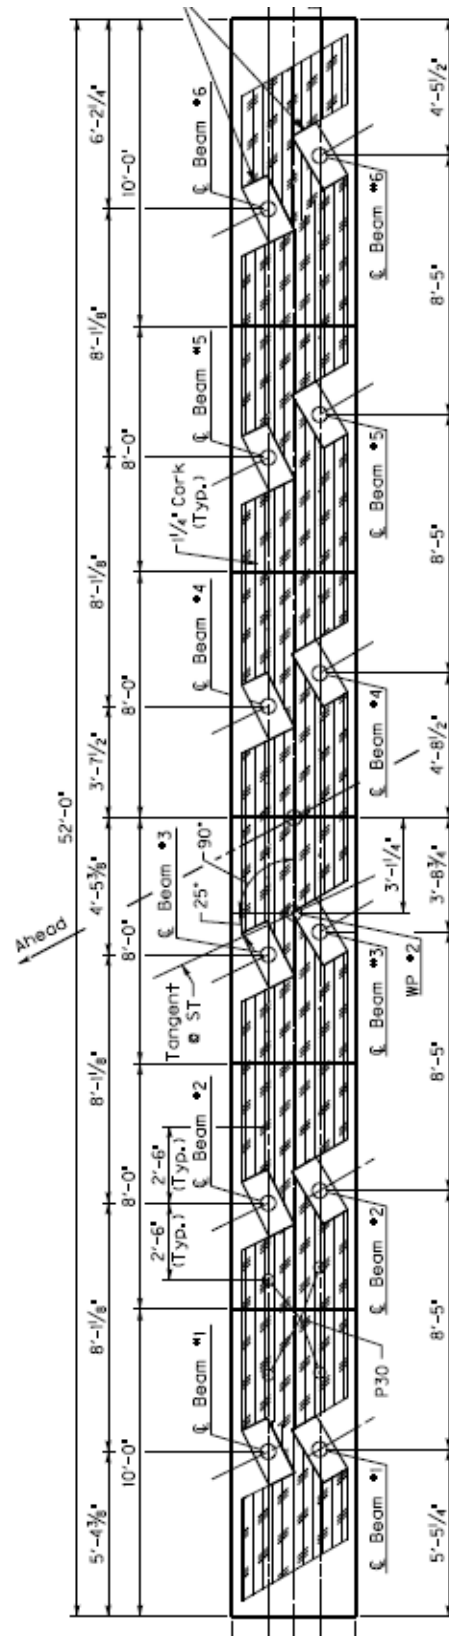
Plan view of elastomeric bearing pad placement atop Pier 1.
